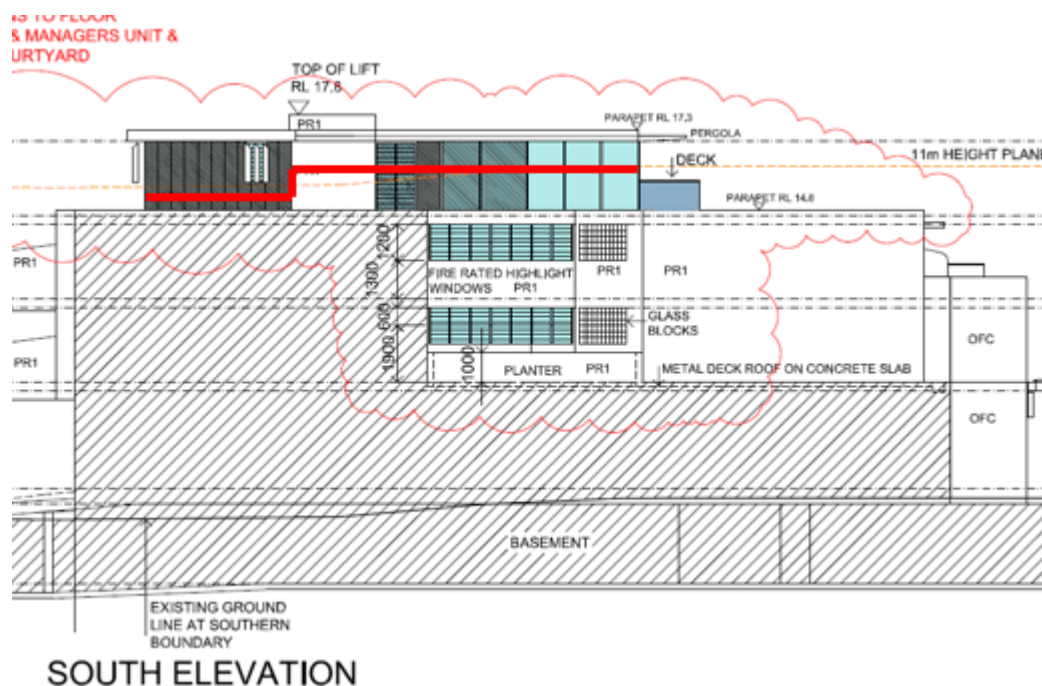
Plan extract showing extent of 11 metre building height breach as viewed from the north
